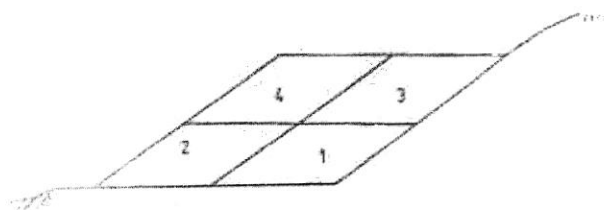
TYPICAL LAYOUT OF HAZARDOUS WASTE LANDFILL
